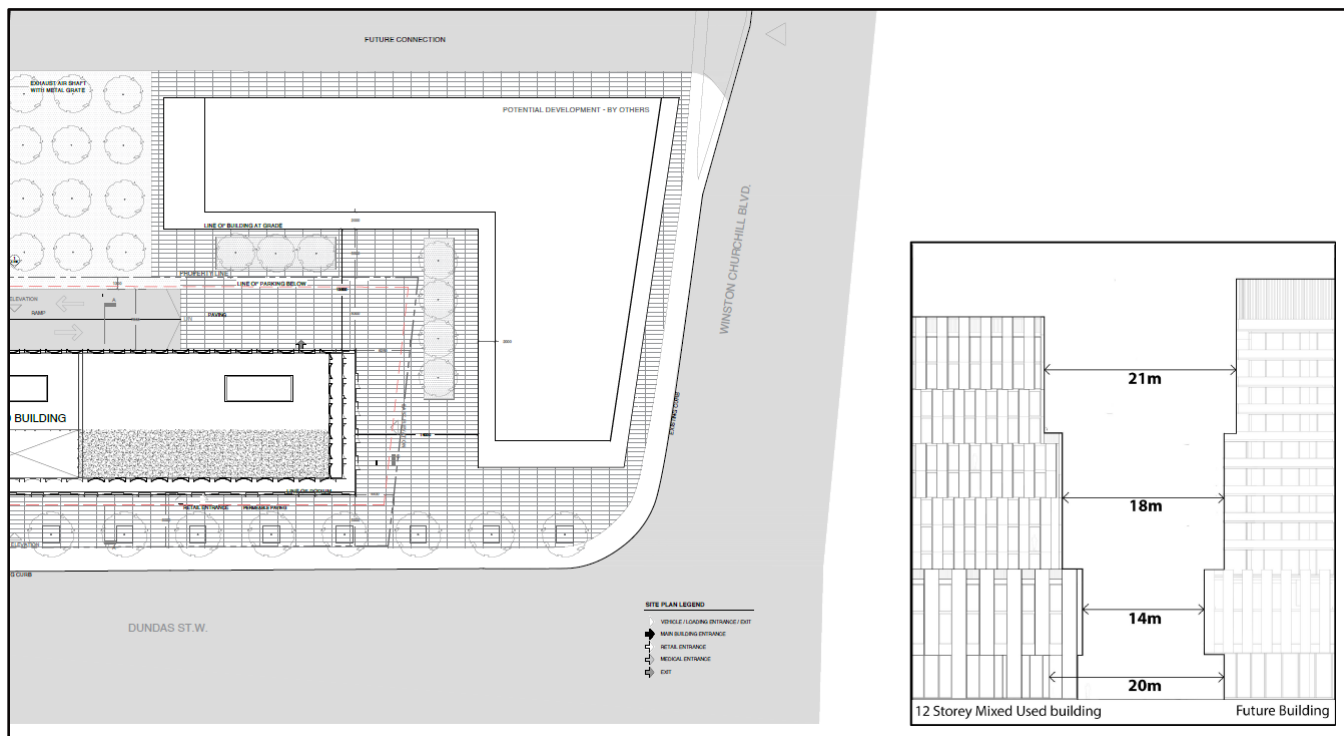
Conceptual Site Plan with Future Potential Building on Adjoining Property, Prepared by Hout Architecture
